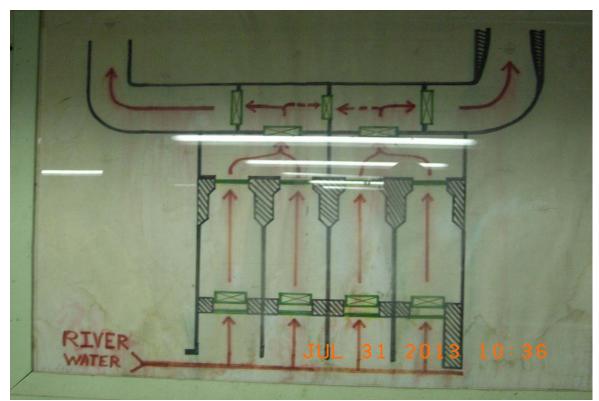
(a): Schematic drawing of the intake conduits at Great Falls Dam.
